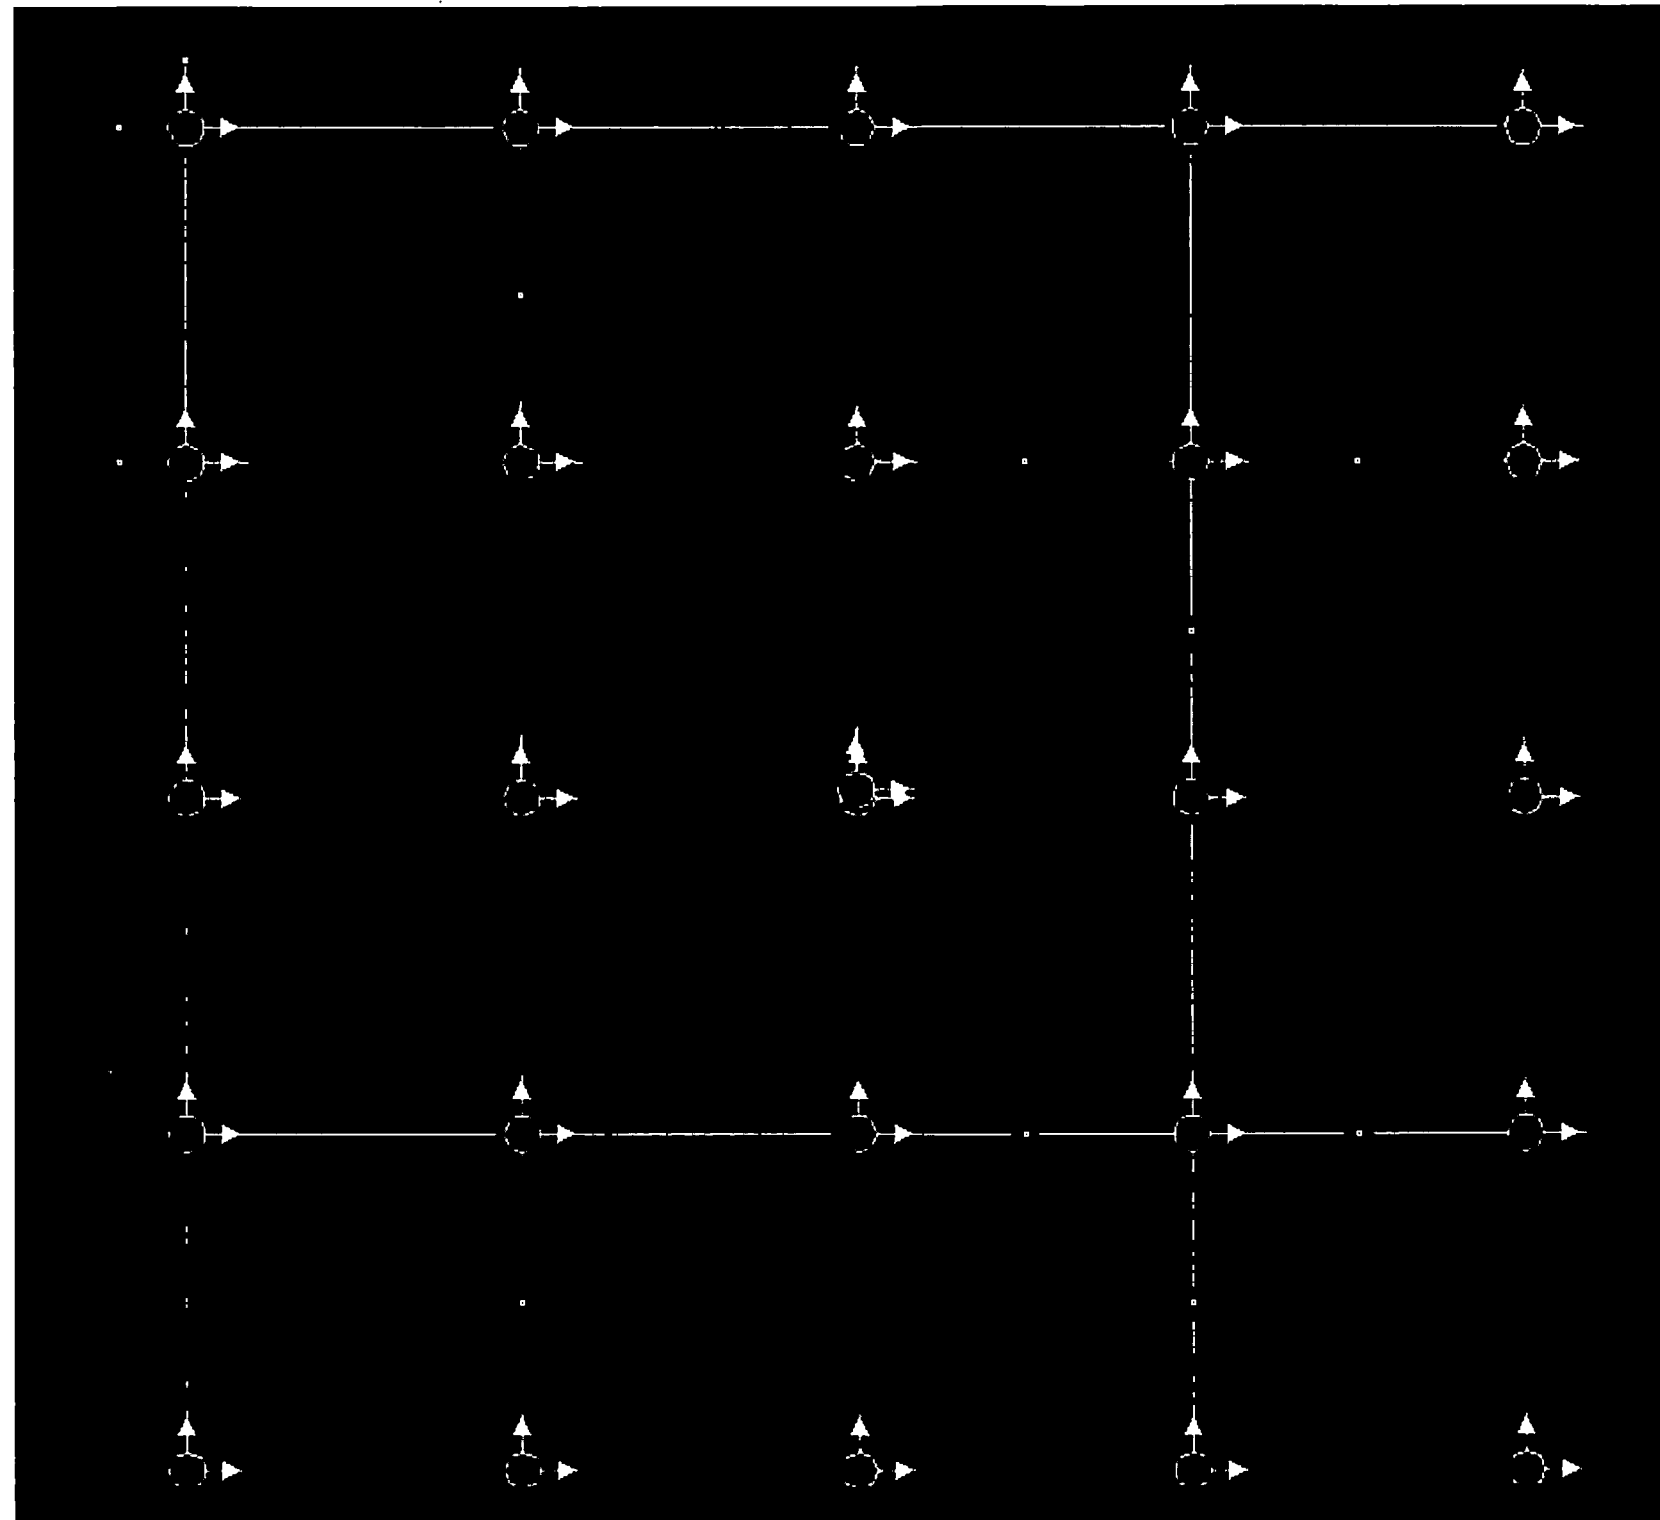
PERFORM-3D Model Roof Plan View, Diaphragm Definition (H1, H2, RV Constraints)
